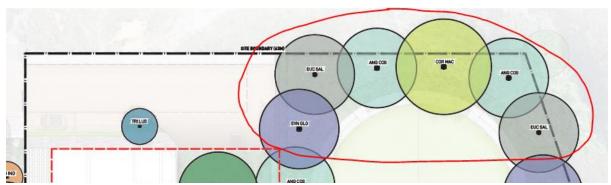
Extract of landscaping plan with proposed advanced tree planting circled in the location of where the Mews road would be required
